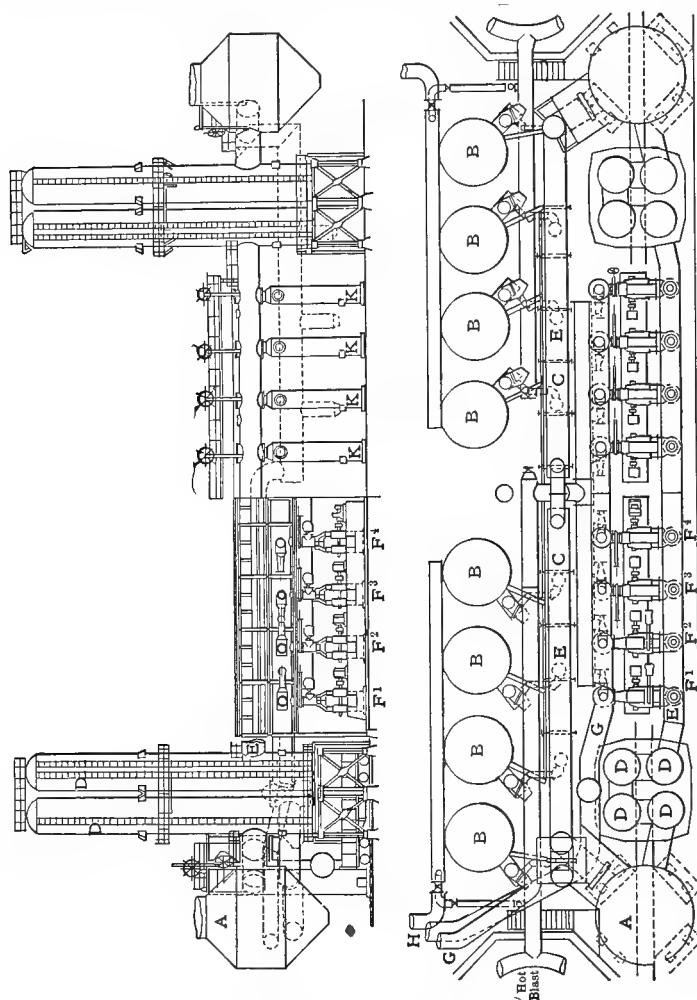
Elevation and Plan of the Gas Cleaning Plant of the Lackawanna Steel Company for its Large Furnaces.
